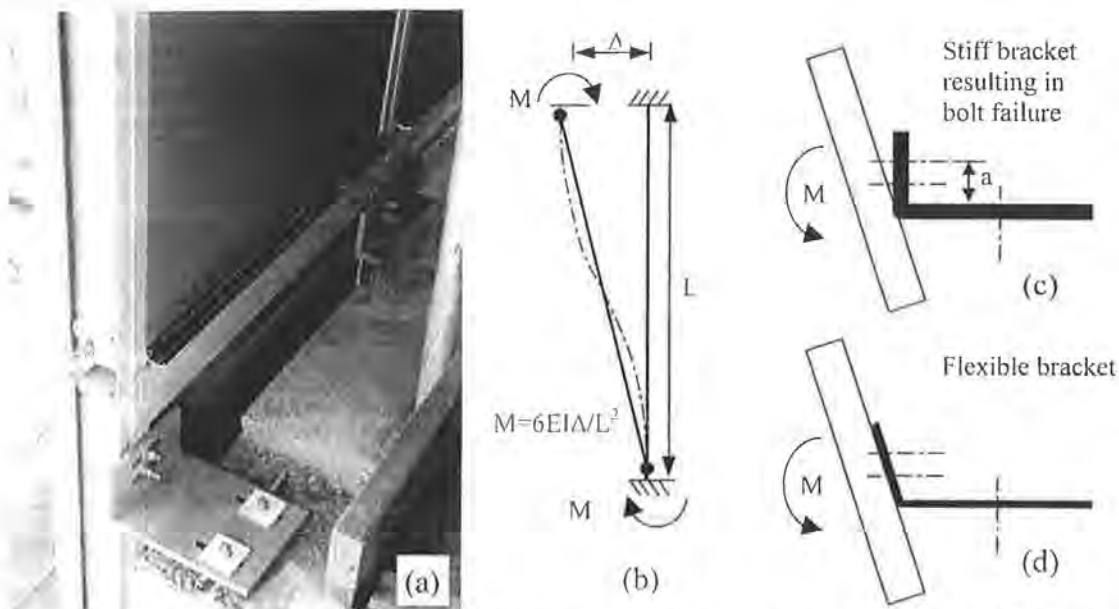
Connections between glazing panels and structure: (a) a photo of a typical bracket support; (b) possible idealisation of panel deformation; (c) bolt failure; and (d) distortion of bracket.
